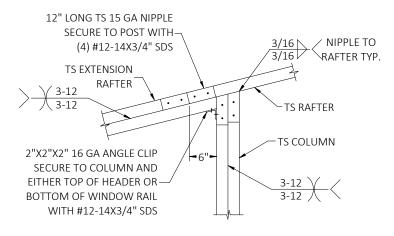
A SIDE EXTENSION RAFTER/COLUMN CONNECTION FOR RAFTER SPANS LESS THAN 12'-0"
